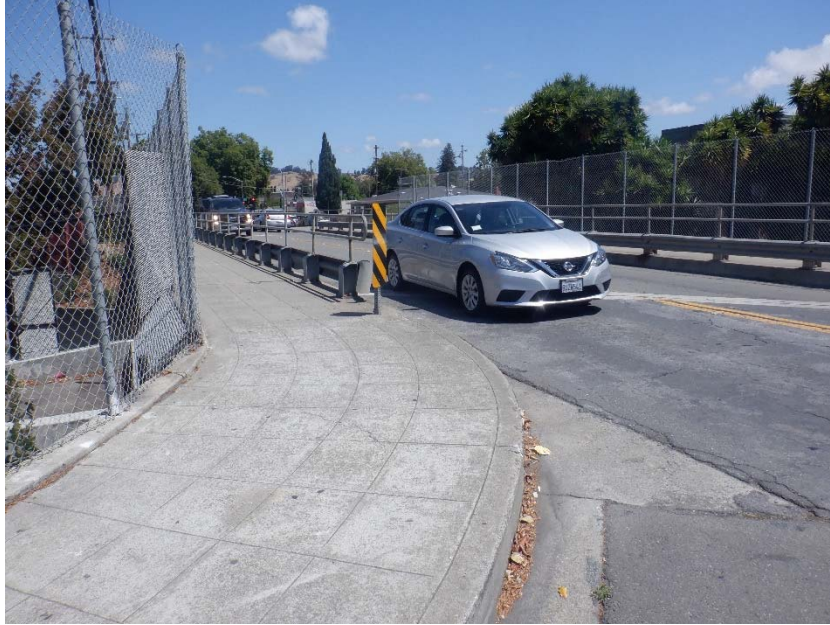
Looking north at the San Lorenzo Creek Bridge where structural elements sampling for asbestos containing material (ACM) and lead base paint (LBP) was conducted.
